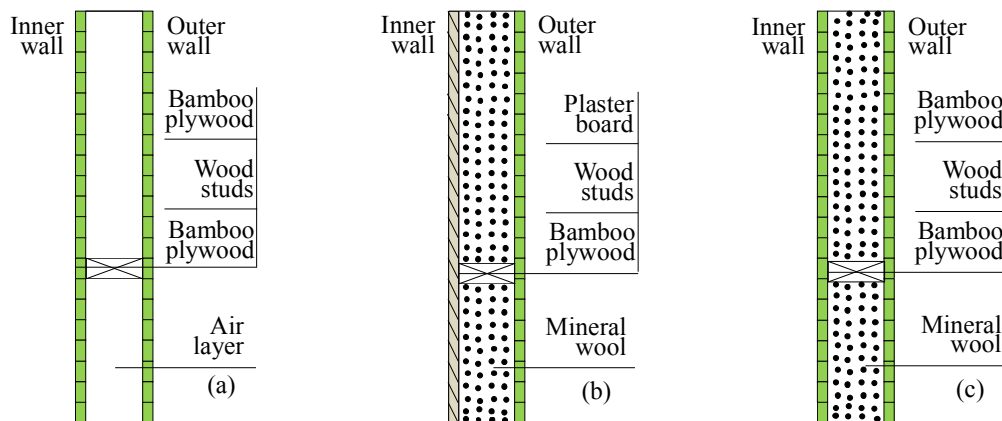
Bamboo-wood sandwich wall: (a) bamboo plywood-overlaid hollow wall; (b) plaster board-overlaid sandwich wall; and (c) bamboo plywood-overlaid sandwich wall.
